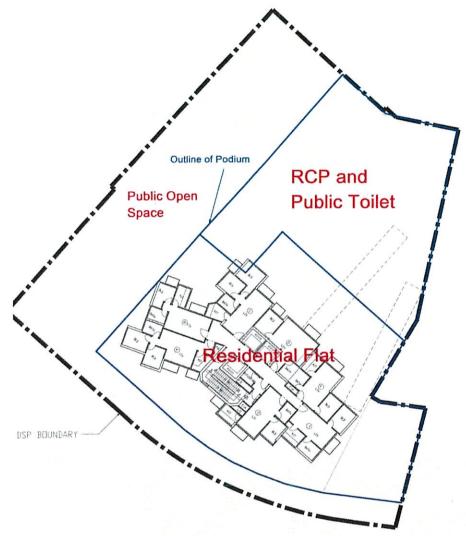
Notional Layout of the Typical Floor Plan (Low Zone)
